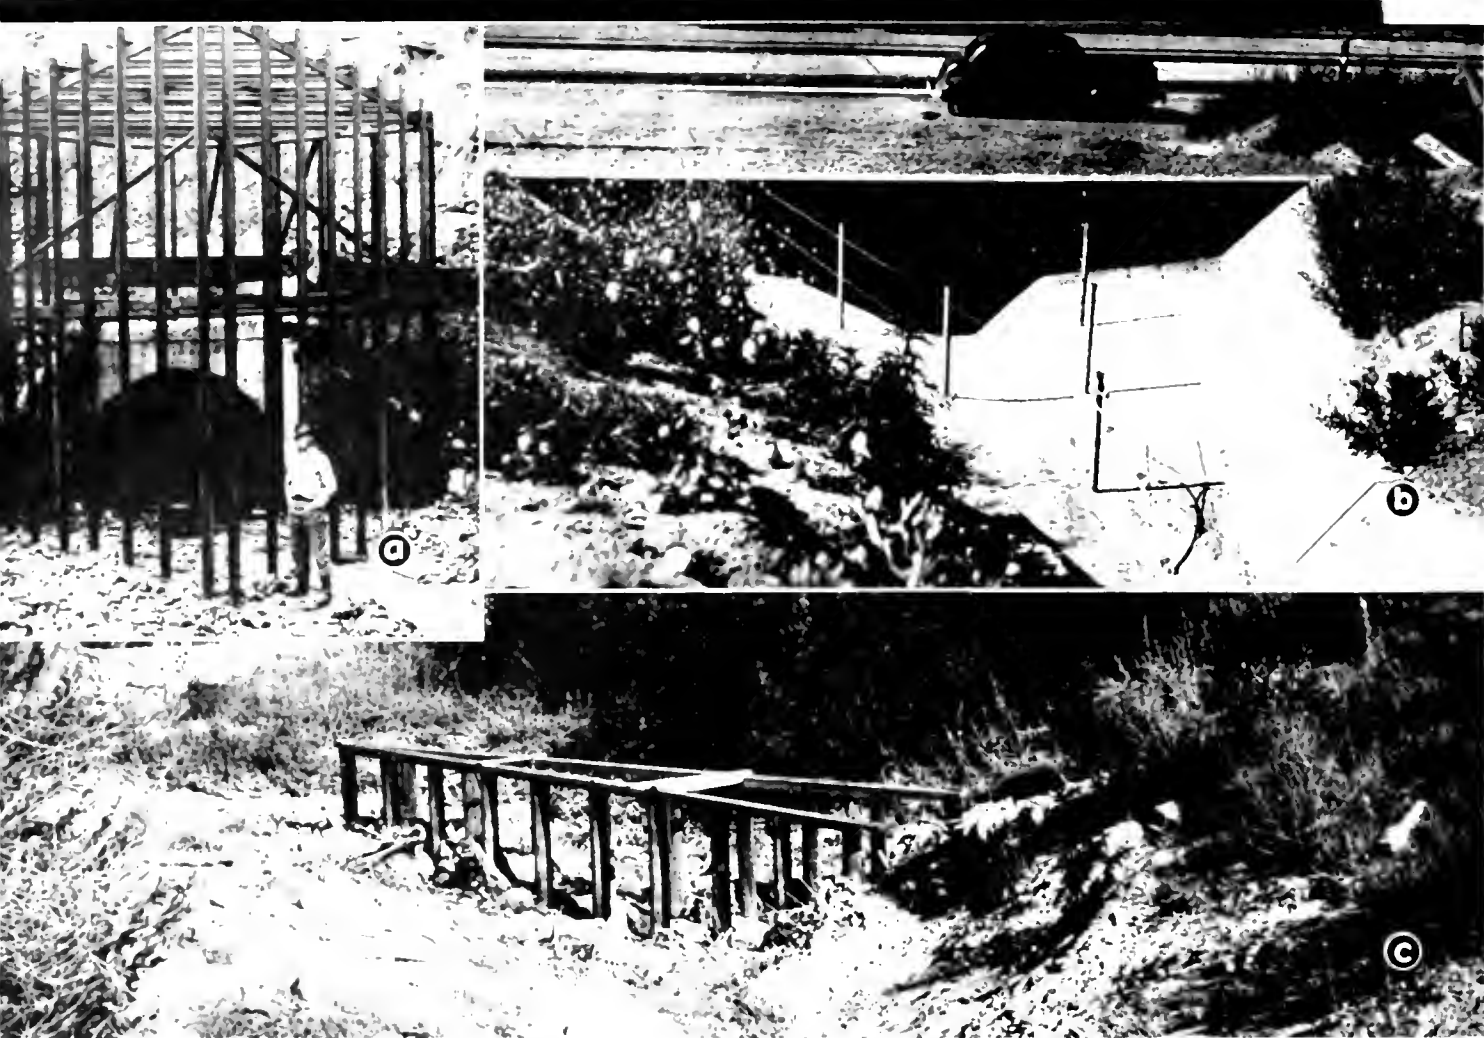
(a) Steel rail debris deflector placed at entrance to a large concrete arch culvert. (b) Wire and pipe debris deflector installed at entrance to R.C.P. culvert to deflect light floating debris. Note drop-down approach to culvert entrance. (c) Wooden pile debris deflector installed at entrance to a large culvert for the purpose of deflecting bed-load of large boulders and heavy floating debris.
